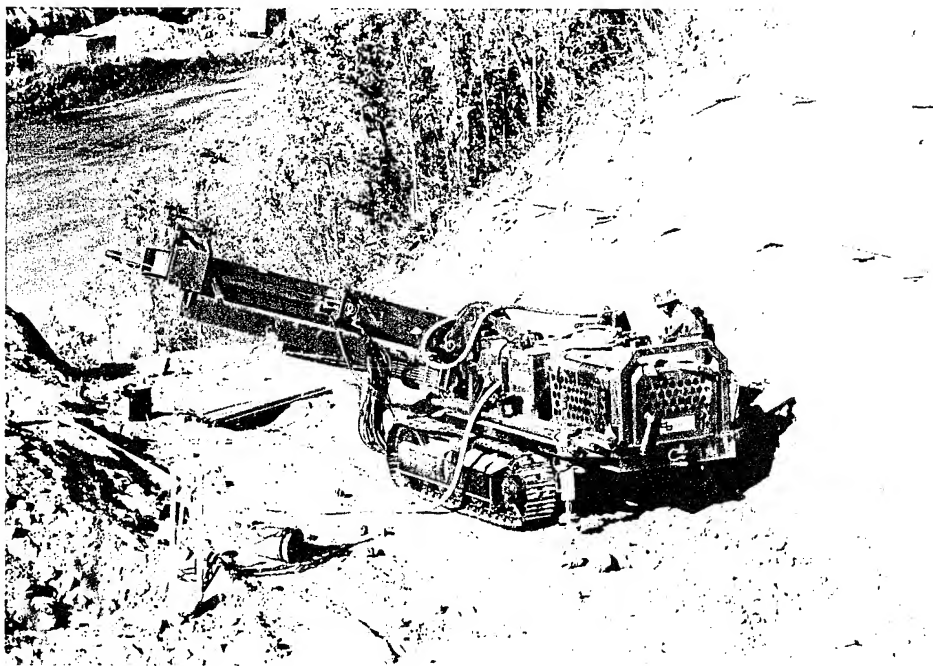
Craelius rotary drill - drilling an anchor hole near the bottom of a cutslope at the downstream portal.
